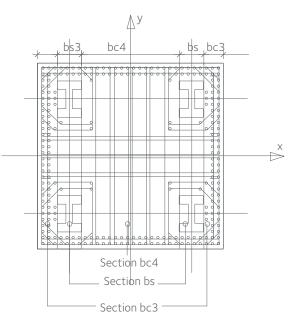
Section layout of reinforcement Example of the Eurocode 4 Design Method
